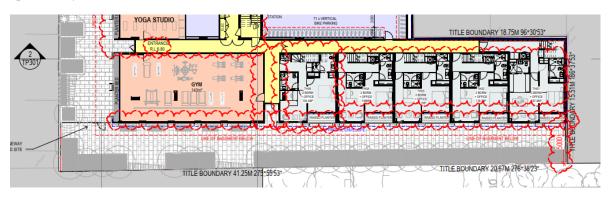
Excerpt of Amended Ground Floor Plan (Point Architects)
